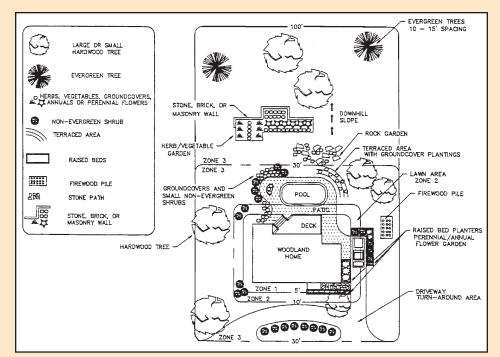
An example of a Firewise landscape site plan depicting zones and plant arrangements. Note that Zone 3 extends out to 100 feet on the downhill slope. The pool can be used as an emergency water supply for fire fighting. (Firewise Landscaping for Woodland Homes, Virginia Cooperative Extension, Publication 430-300)
